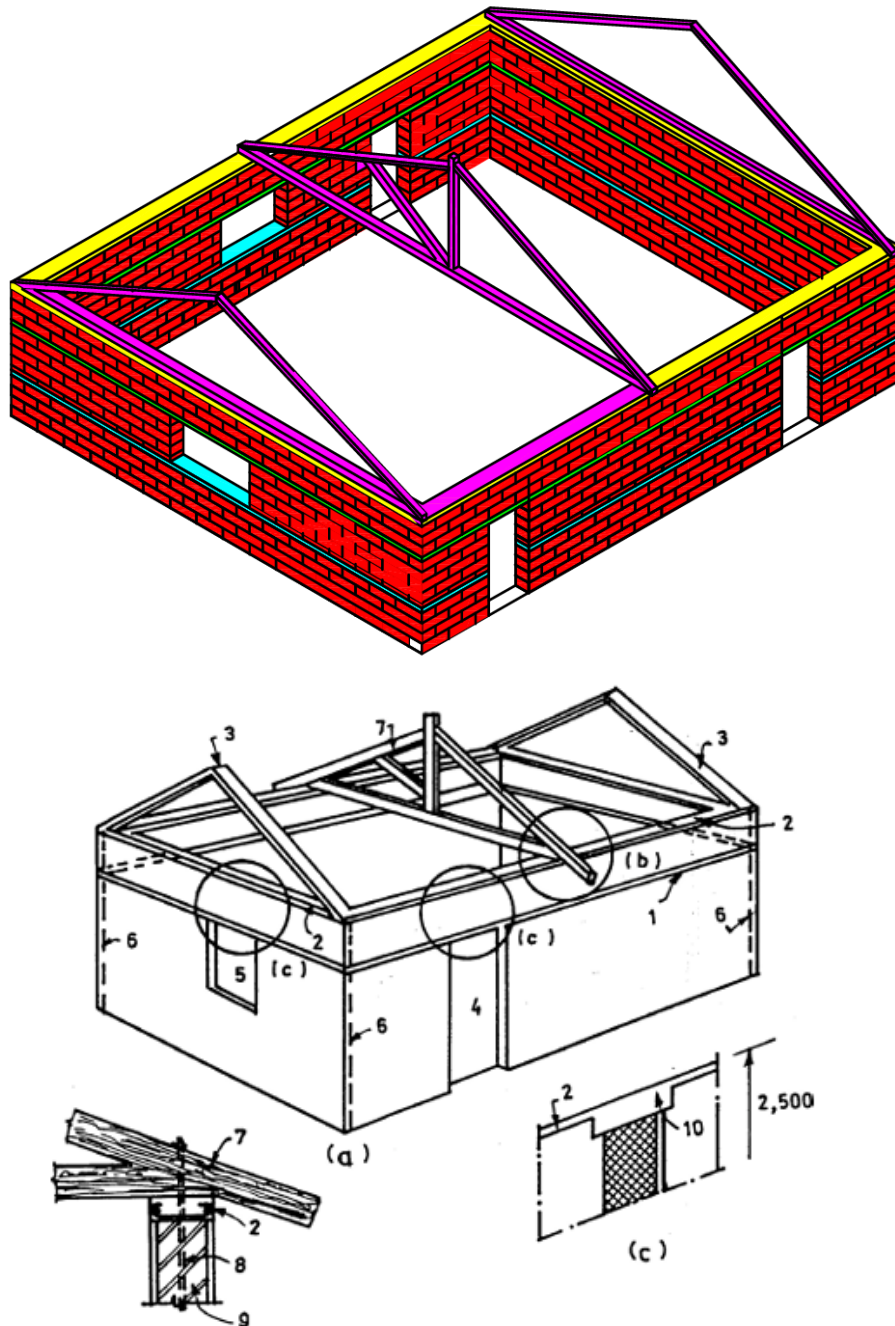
OVERALL ARRANGEMENT OF REINFORCING MASONRY BUILDINGS
